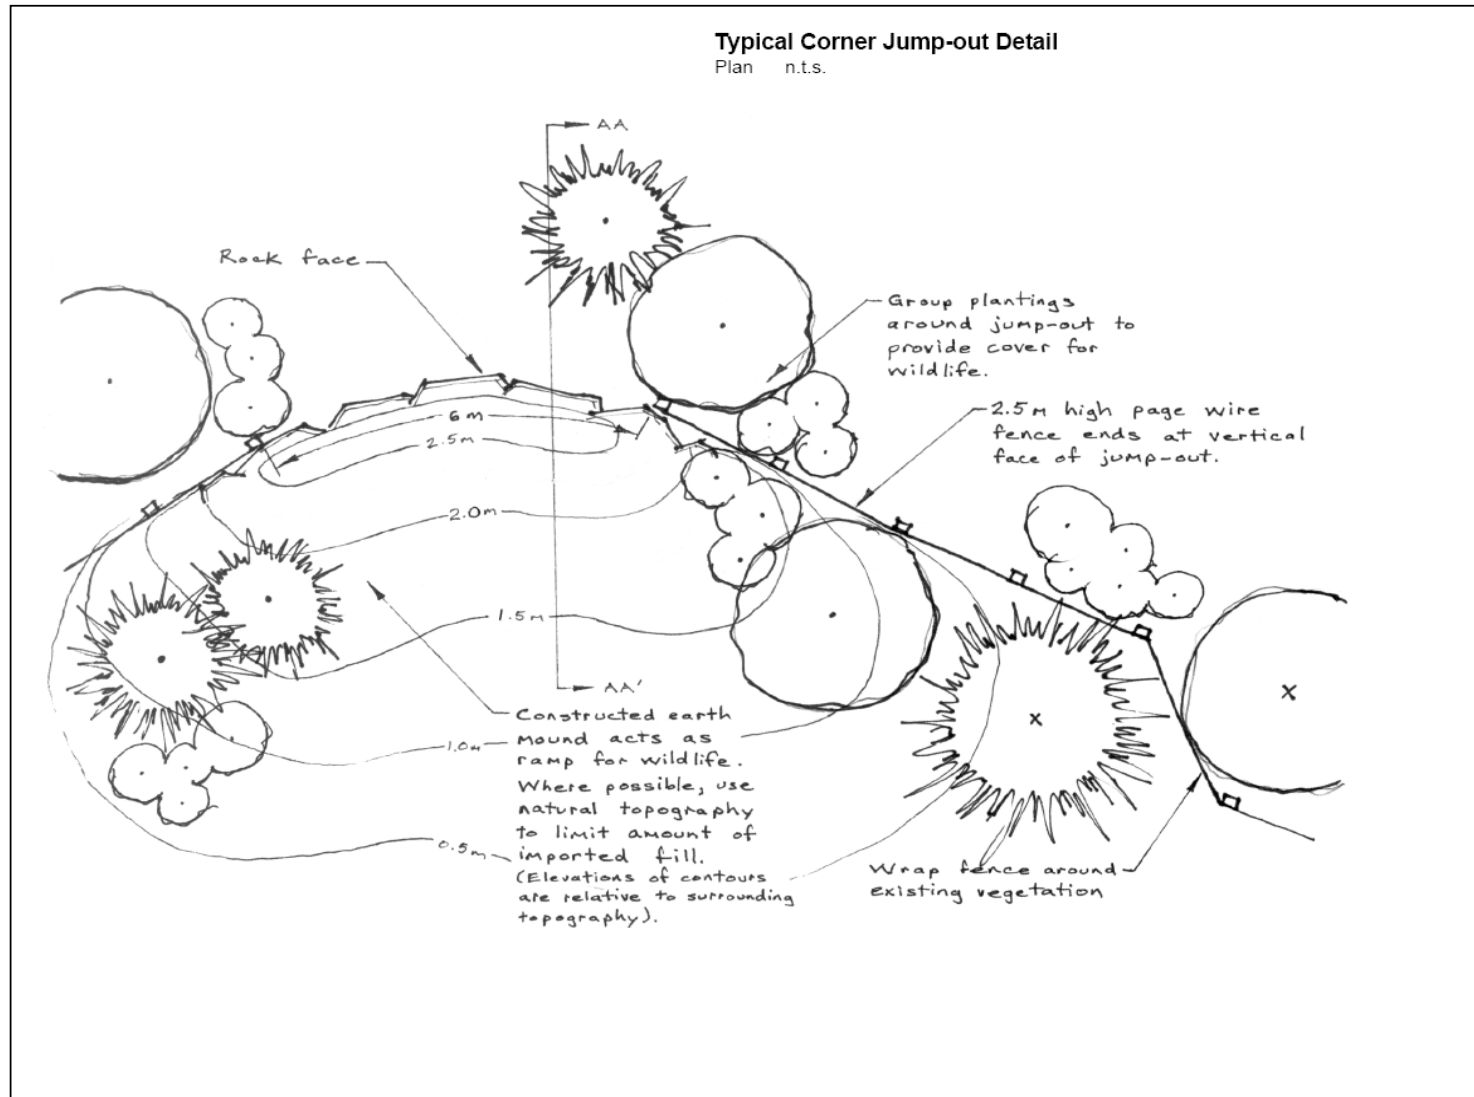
Wildlife jump-out typical details provided to US 93 design consultants (Jones and Jones 2002b).
